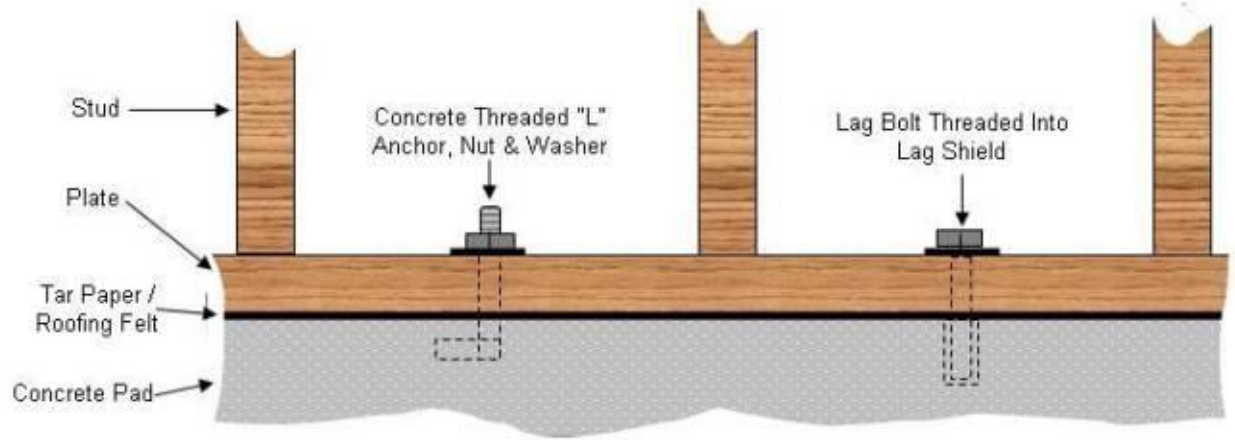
Anchor Detail for the Guard Booth to the Concrete Pad
